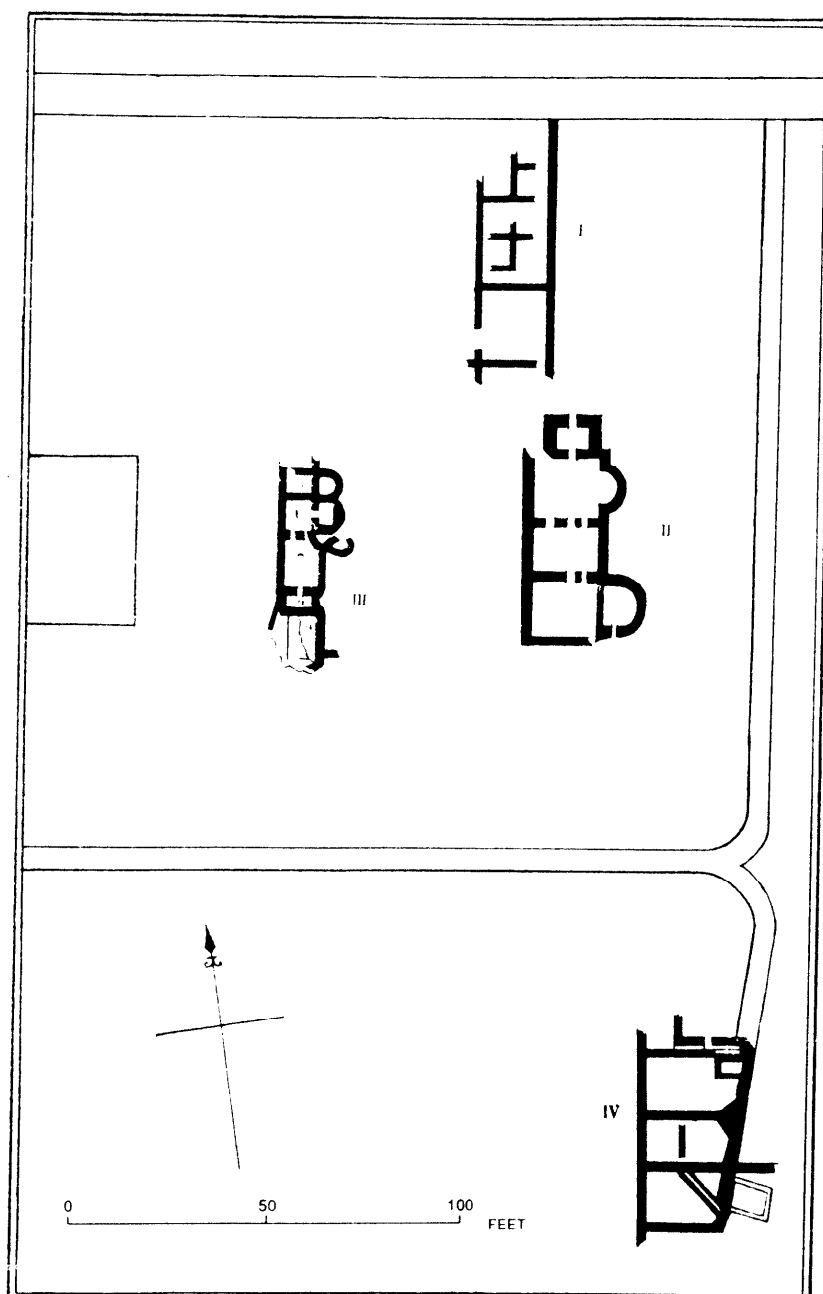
Overall plan of structures excavated in the 19th century. I east range of courtyard building; II bath-house B2; III bath-house B1; IV extramural building.
